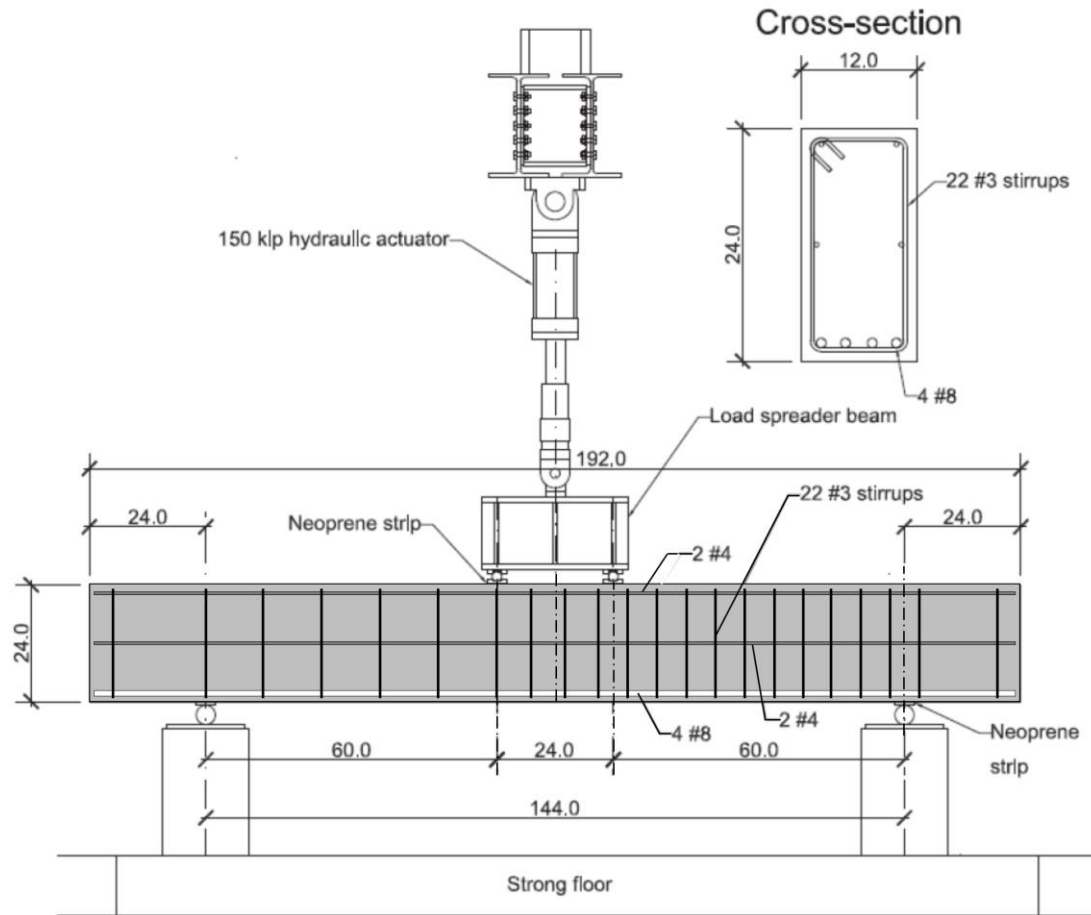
Shear beam elevation view of reinforcing details, geometry, and the typical beam loading setup for four-point bending test. Courtesy by: Thomas Schumacher.
